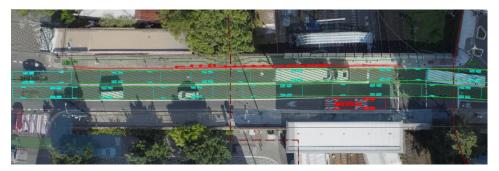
Turn paths on existing road configuration for buses travelling north-south direction on Illawarra Road over the railway bridge.
